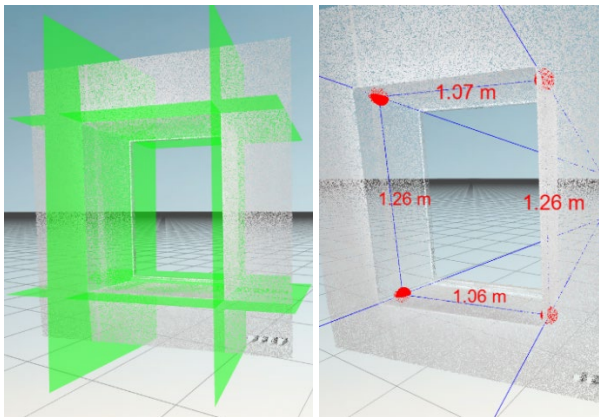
Detected window reveal planes (left) and dimensioning of window opening (right)
